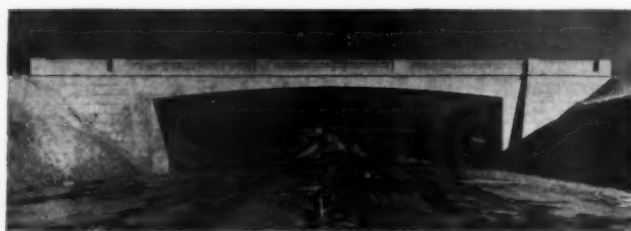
Typical Rigid Frame Overhead, Restrained Beam Type With "U" Wings
